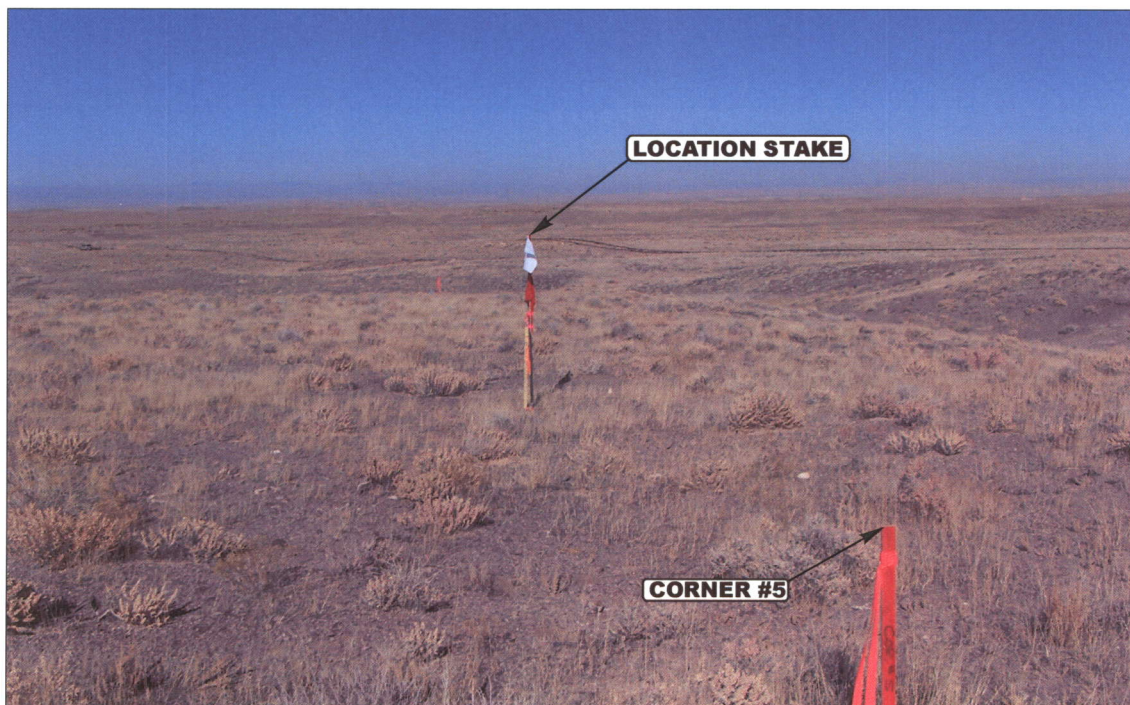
PHOTO: VIEW FROM CORNER #5 TO LOCATION STAKE
